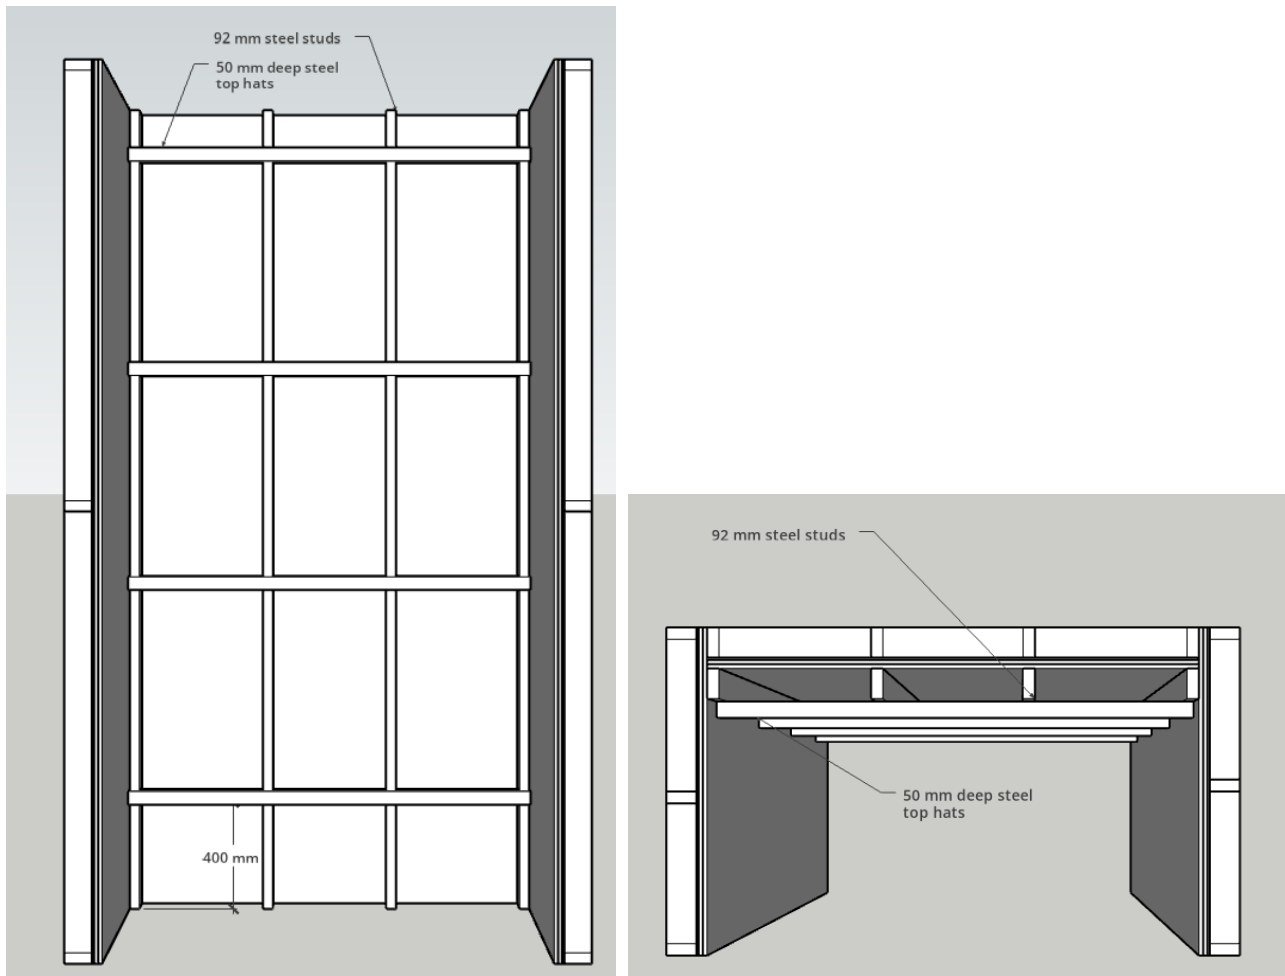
Front and top views of specimen support frame showing steel studs and top hat locations without specimen installed.
